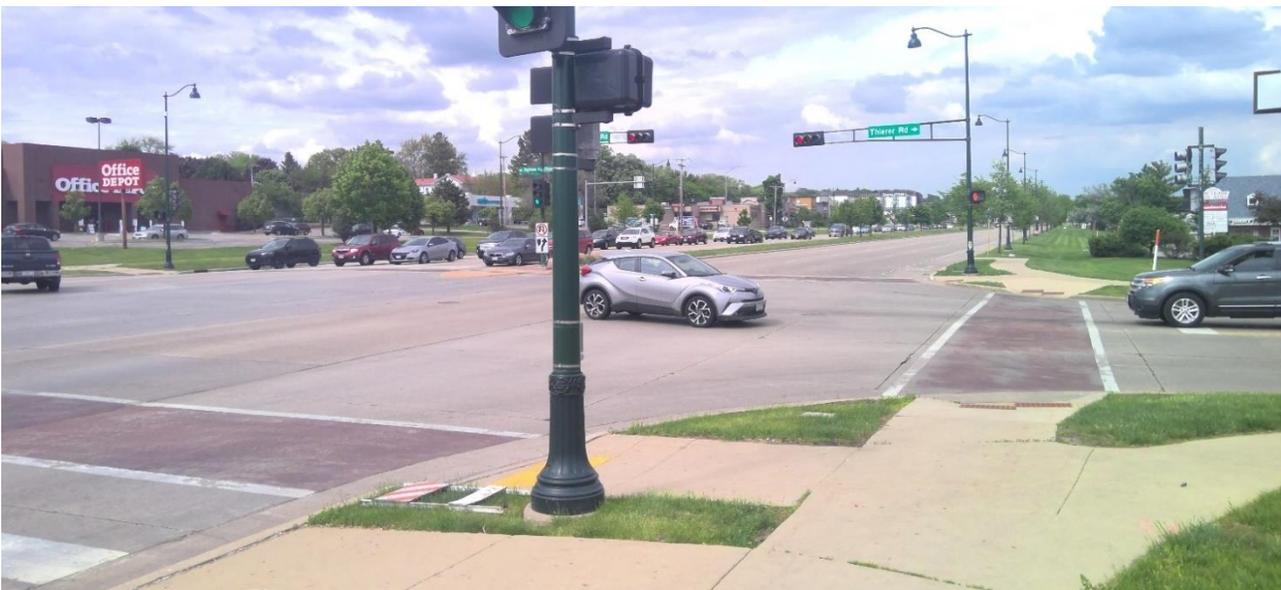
Existing Conditions – Thierer Road – Portage Road (Southwest Facing)
